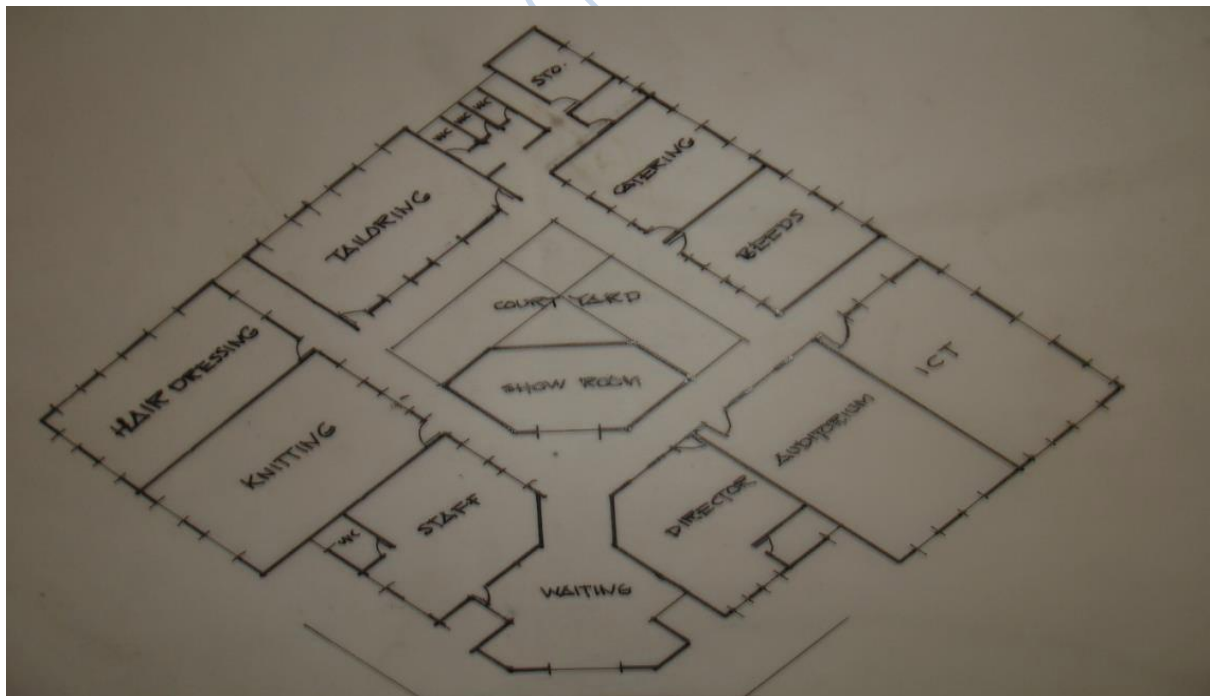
Floor plan. Source: Ministry of Works and Housing, Jos, Figure au State.
